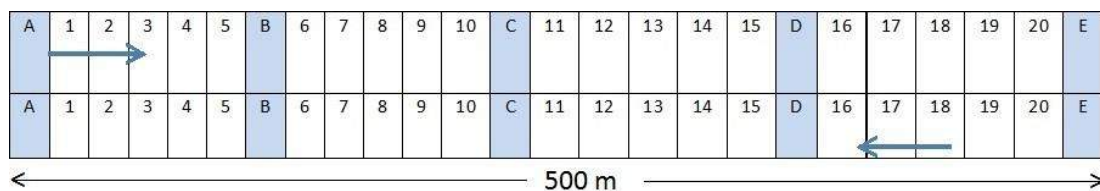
Layout of LTPP sections on Agostinho Neto
